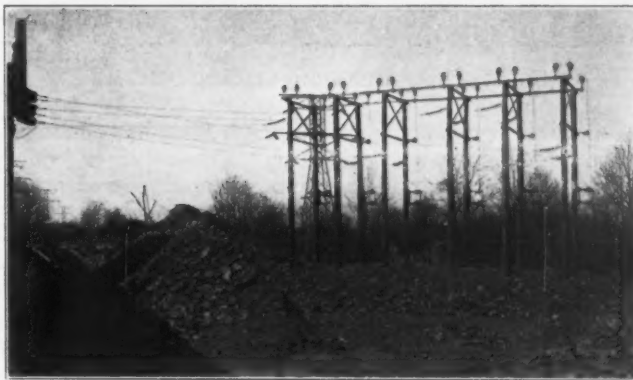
LIGHTNING ARRESTERS AND TERMINAL STRUCTURE AT POWER HOUSE
